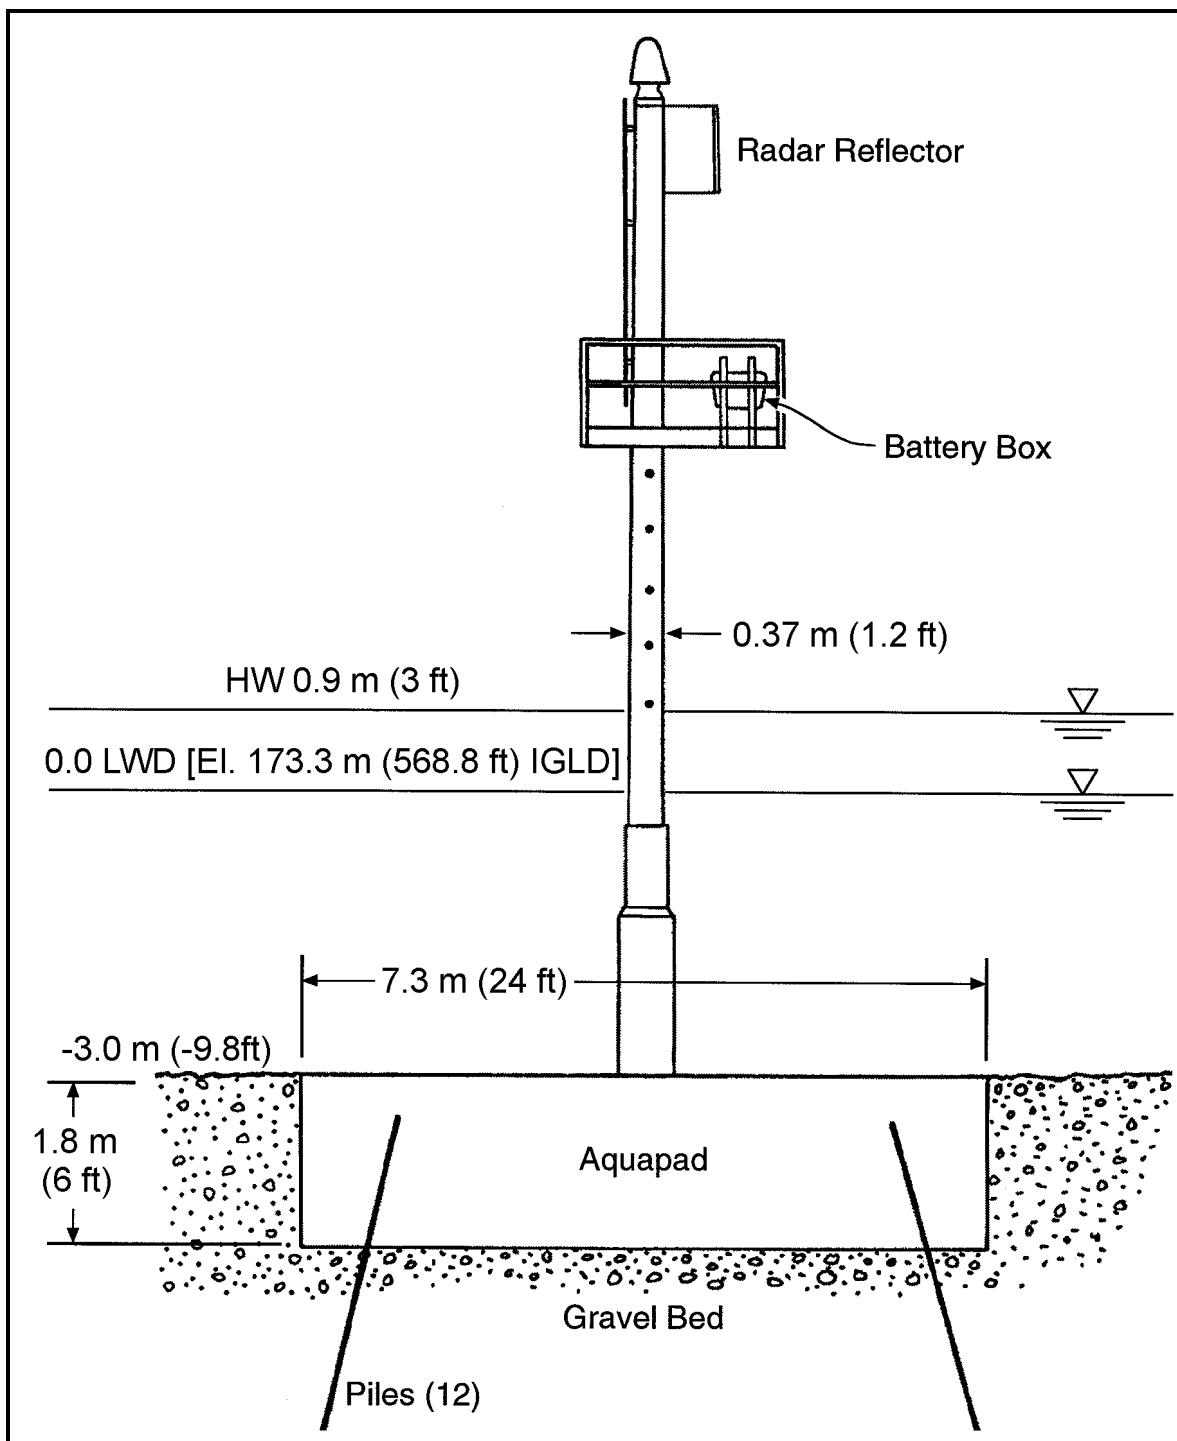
Steel light tower on Maumee Bay, Lake Erie. The tower has a square cross section
